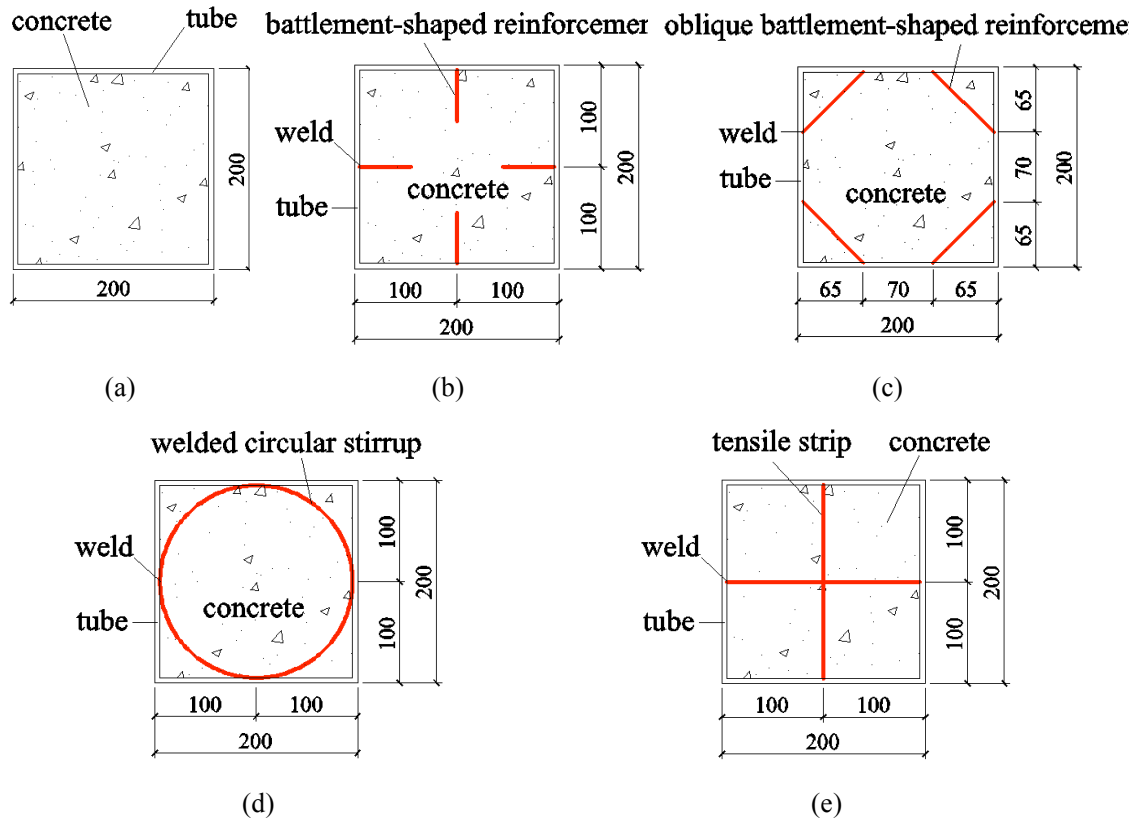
Cross sections of hollow steel tubes with stiffeners (unit: mm)
